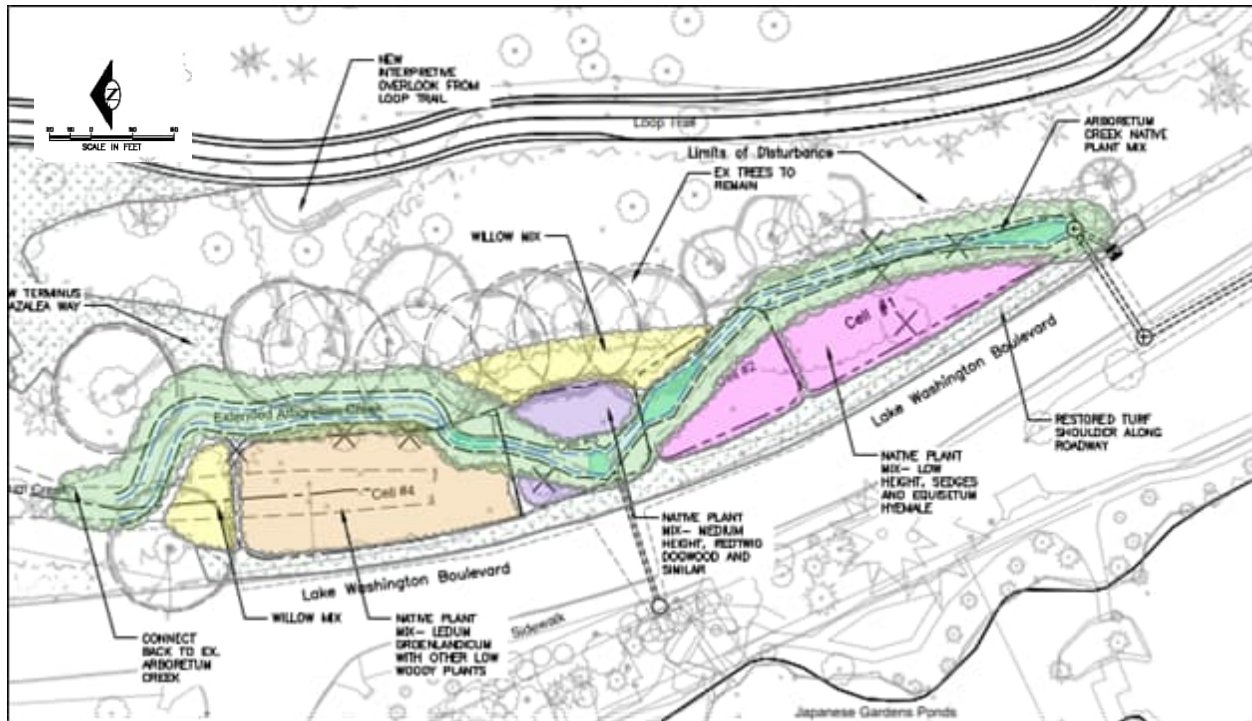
Proposed Planting Plan for the Arboretum Creek Headwaters and Subsurface Gravel Wetland
